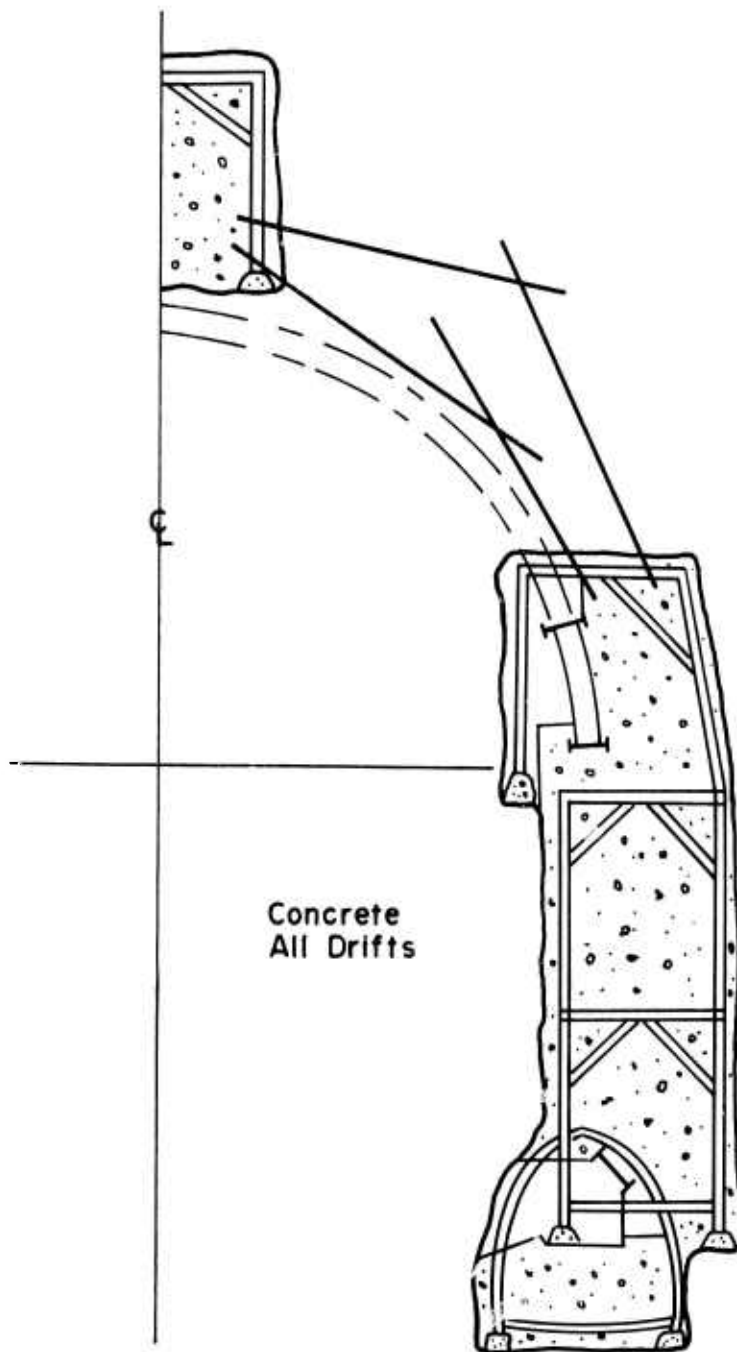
MULTIPLE DRIFT SYSTEM, STRAIGHT CREEK TUNNEL, ZONE II, STATION 84 + 00 TO STATION 85 + 60 (after Hopper et al., 1972).
